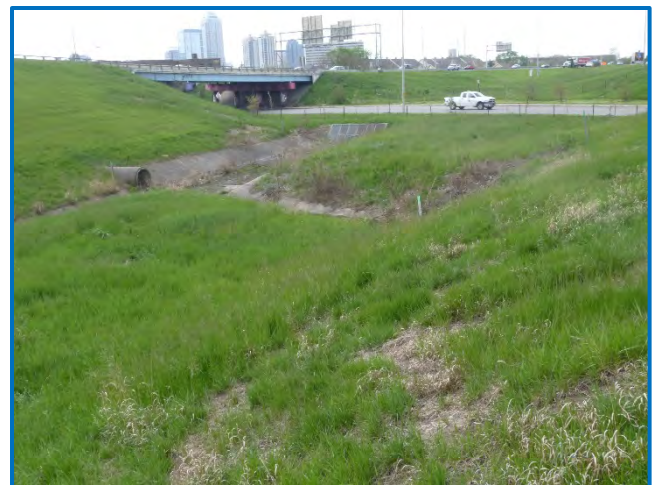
View of SWF-1 and SWF-2 to Pogues Run facing southwest (4/26/2016). No OHWM was observed. College Avenue is adjacent to the west (right).
